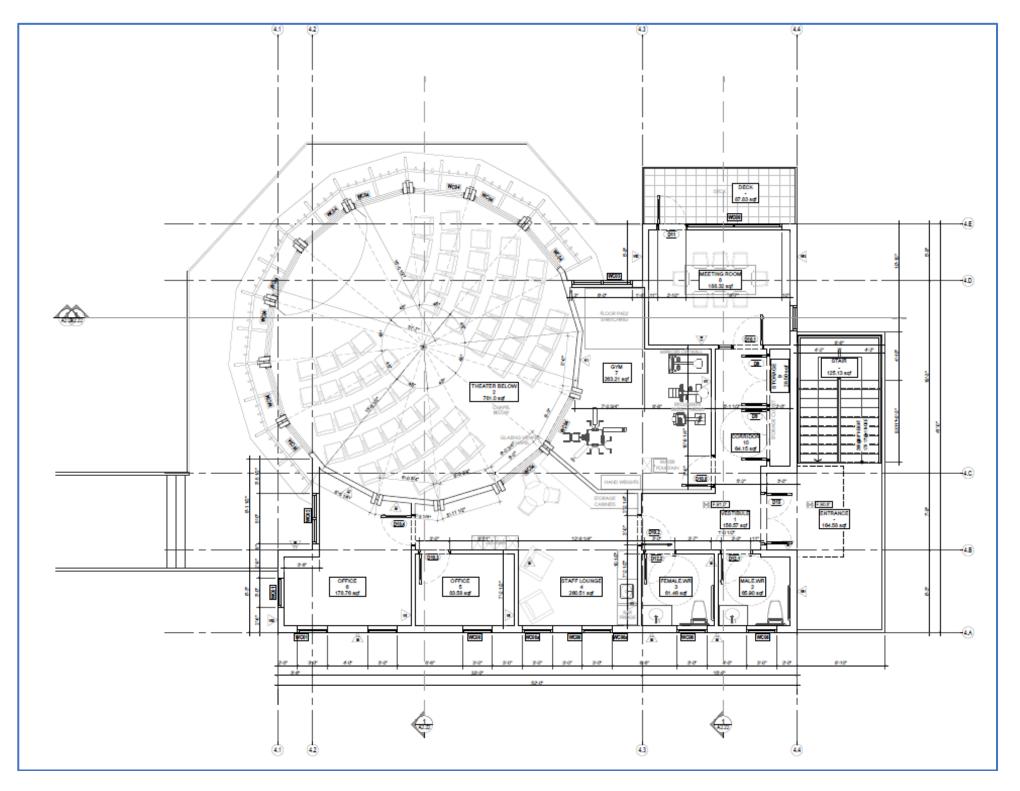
Upper floor of the Convention Room in the *Proposed Development* (this building is not visible in Figure 3). The upper floor of the Convention room will house a gymnasium, a meeting room with a deck and staff facilities. *Image modified from HNPA Architecture+Planning Inc. by Coastal Raintree Consulting, Ltd.
